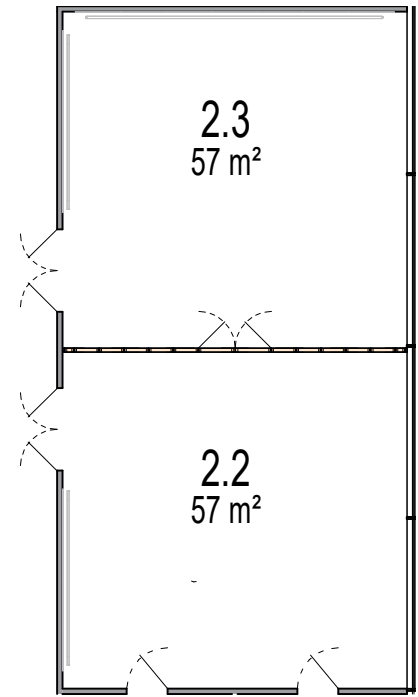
Flexible dance halls with closed moveable walls-floorplan
